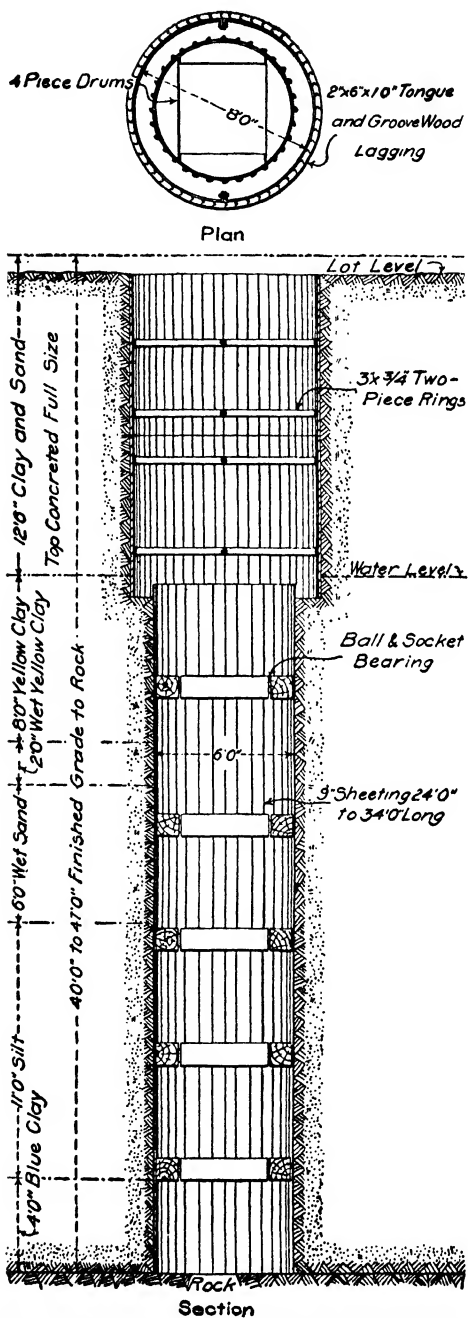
Open Well for Railway Exchange Building, St. Louis.
